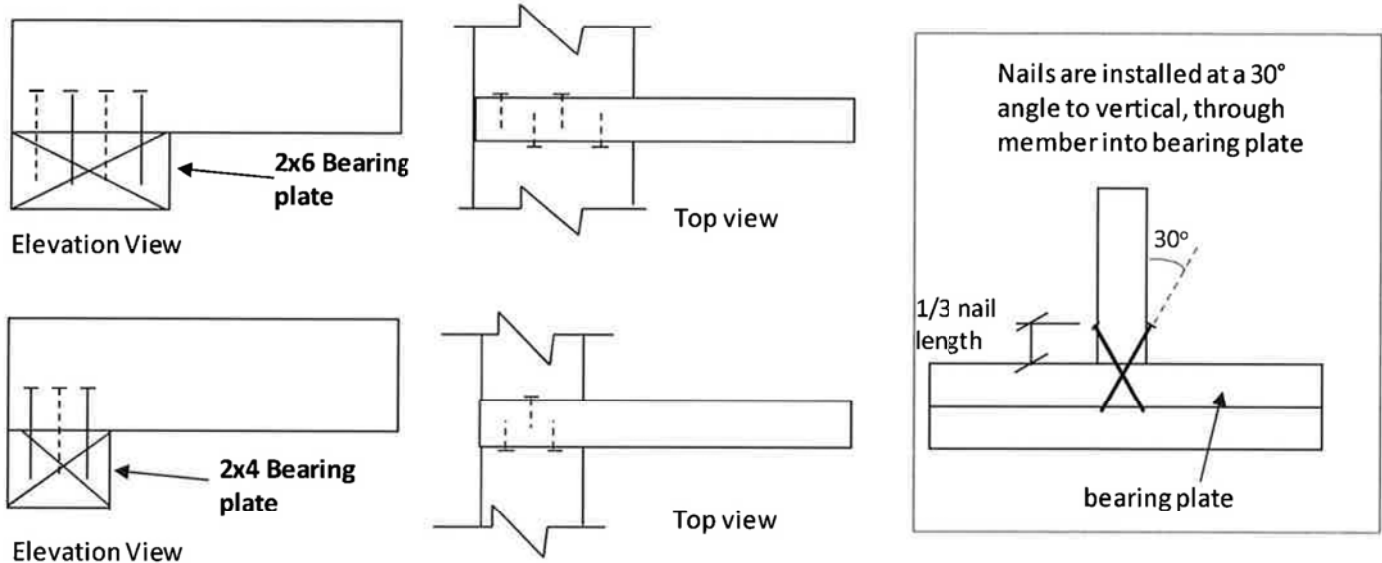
Toe-Nailing Rafter / Ceiling Member to Girder Truss
